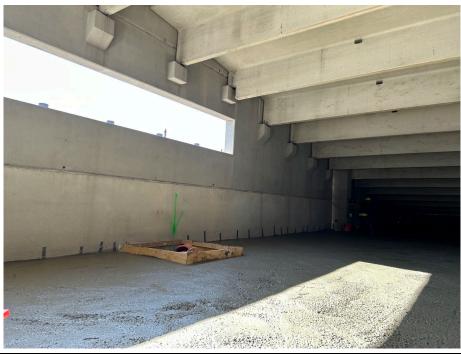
Small area below ramp in B2 boxed out for further utilities installation, vapor barrier to be sealed and inspected after this installation.
